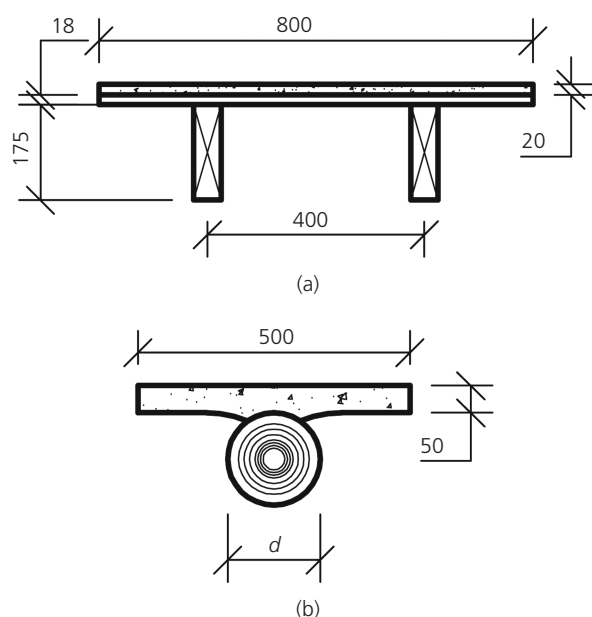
Specimen dimensions: (a) type 1 specimen; (b) type 2 specimen (all dimensions in mm)
